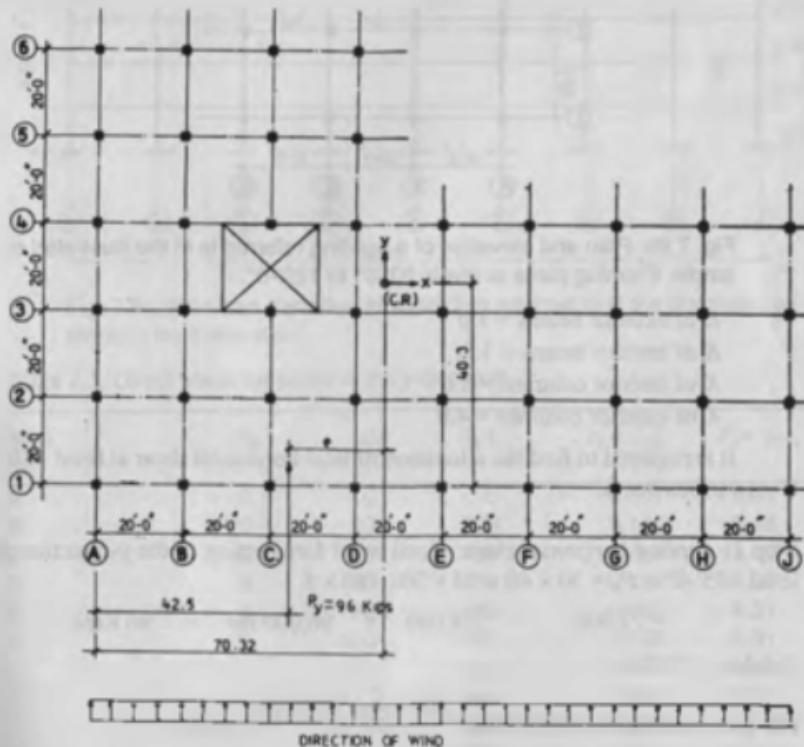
Plan and elevation of a building referred to in the illustrated example. Framing plans at levels 0'-0", 10'-0" to 80'-0".
